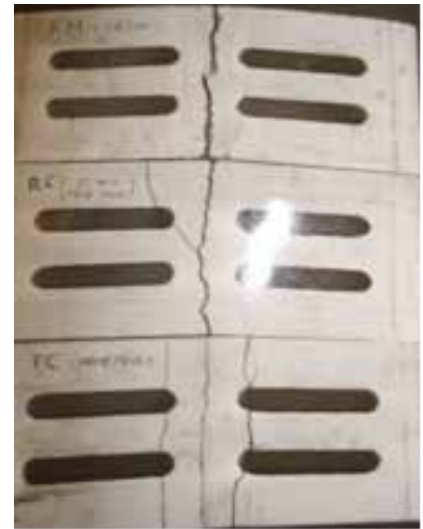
Cracking pattern of fibre mortar, reinforced concrete and Ferrocement pavers
